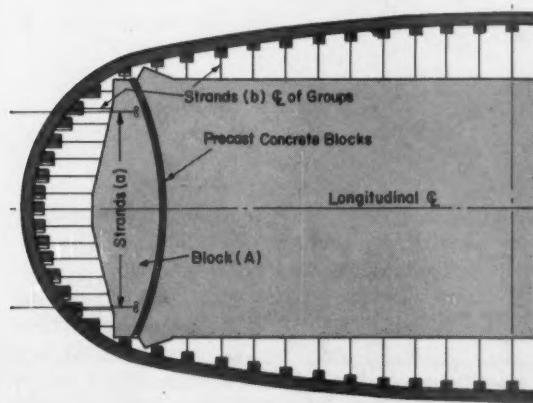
Section of pavement is poured with precast blocks separating Block (A) from longer main slab.
